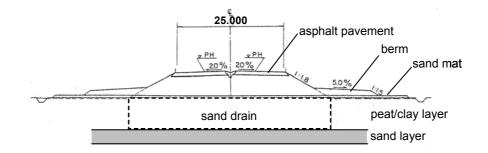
Typical cross section of the embankment in Ebetsu-Futo East Works
